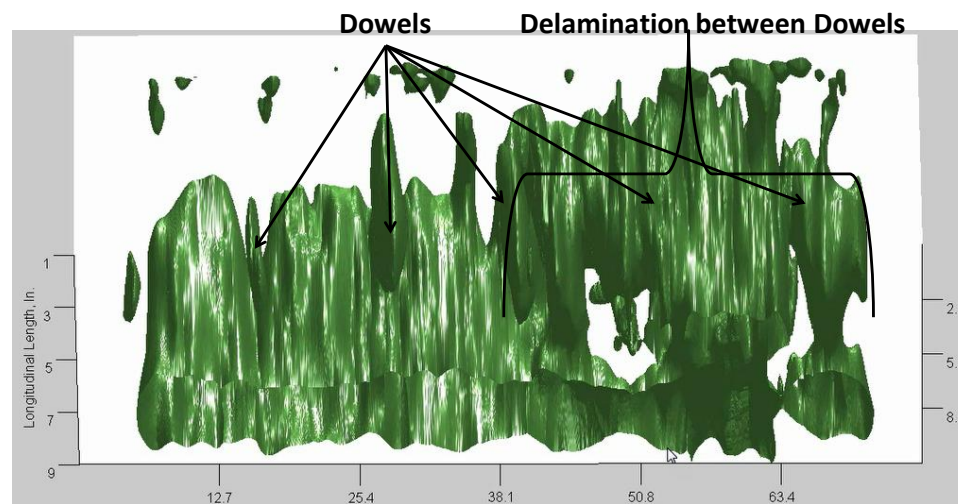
SAFT 3D reconstruction indicating a delaminated condition in the joint #2 passing lane leave slab.
